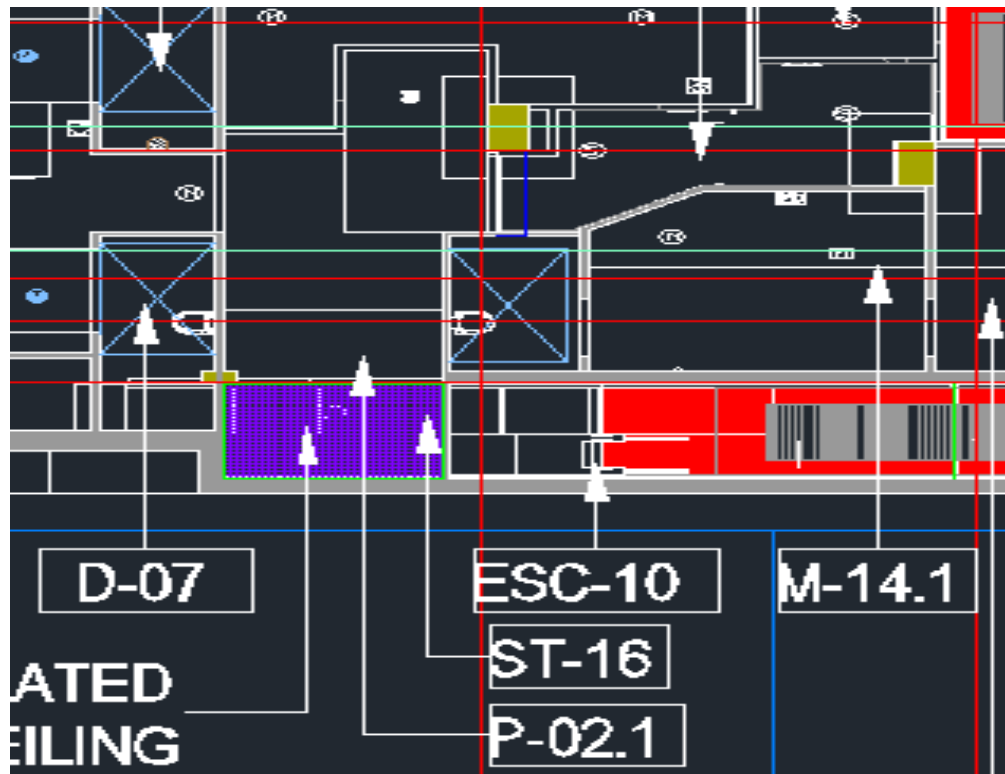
AutoCAD layout (Floor Plan) of TVS Switchgear Room (P-02.1)
